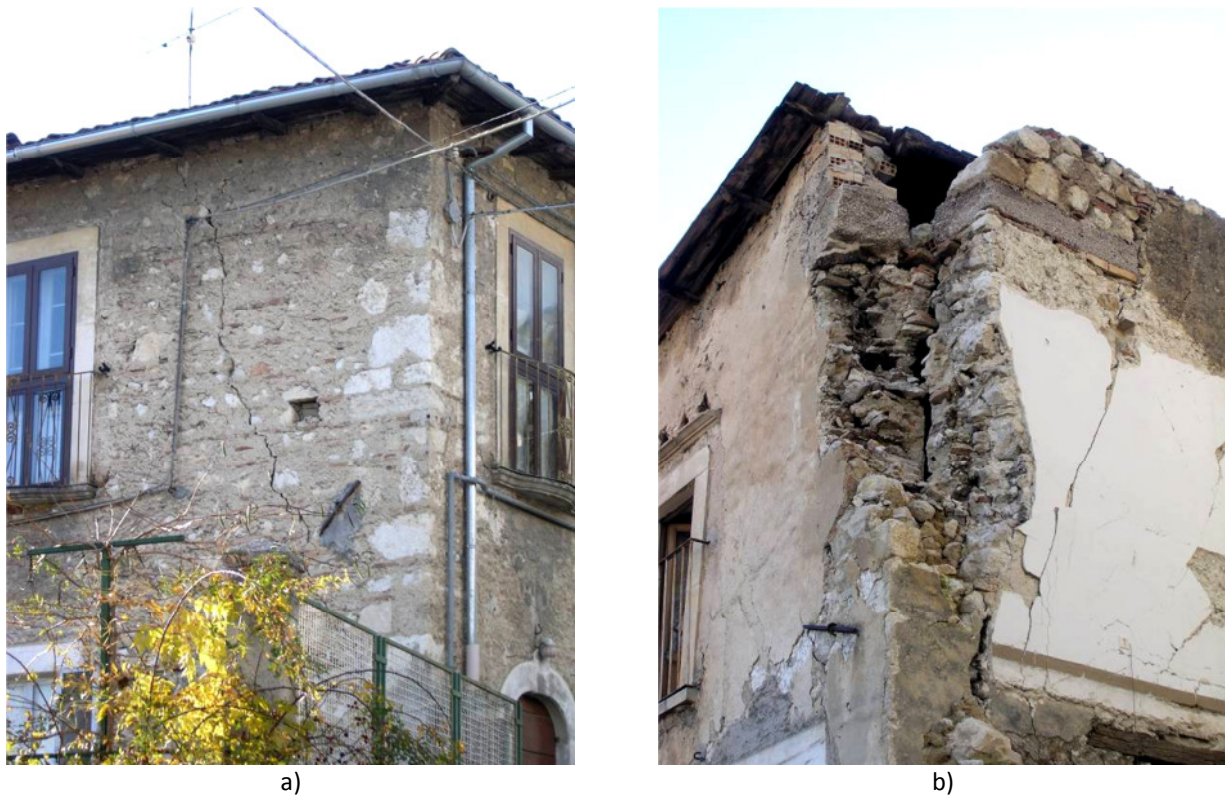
Bazzano (L'Aquila). Detailed views of the buildings presented in figure 2.8: a) the texture of the walls reveals an edge built with larger shaped well connected stones and the floors are even connected to the vertical masonry walls through tie rods as shown by the head of the rod visible on the façade; b) the collapse of the building is due to an insufficient connection between the components of the building (author's pictures).
